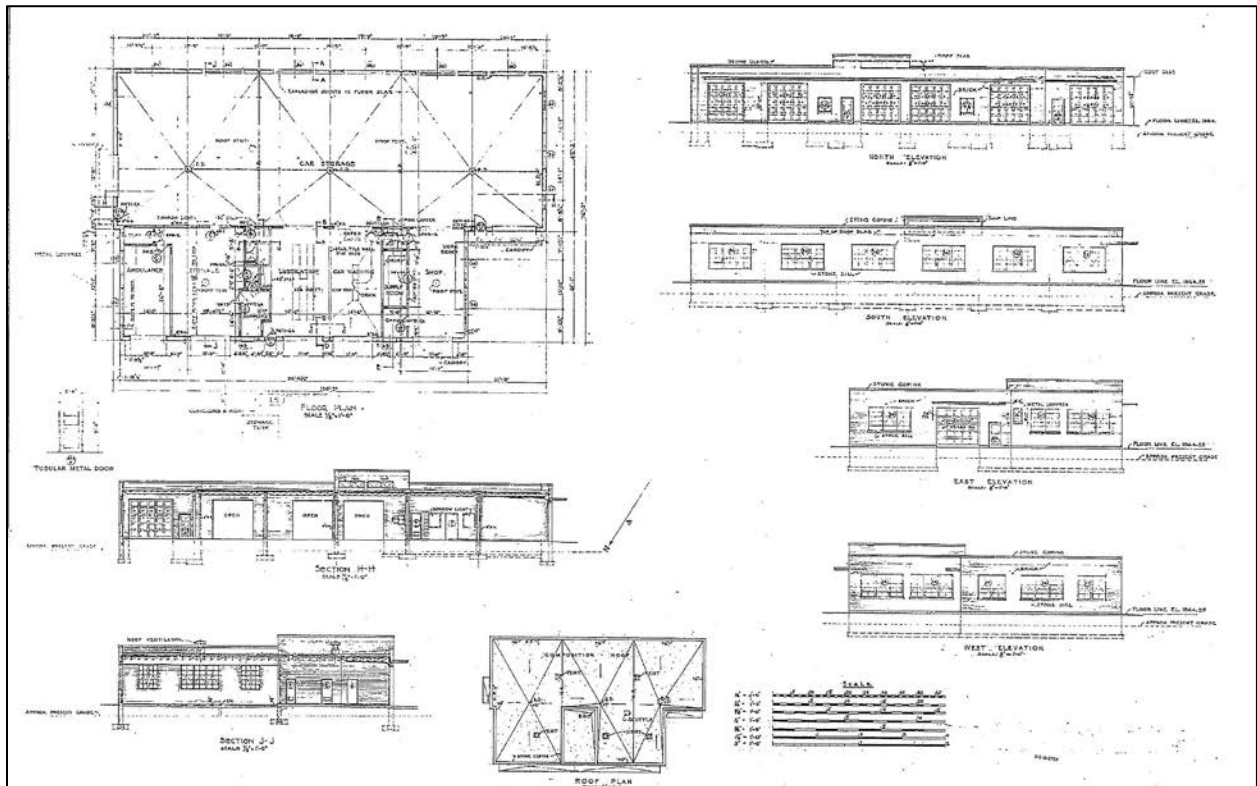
Plans and elevation drawings for the garage (Building #8) (VA).
